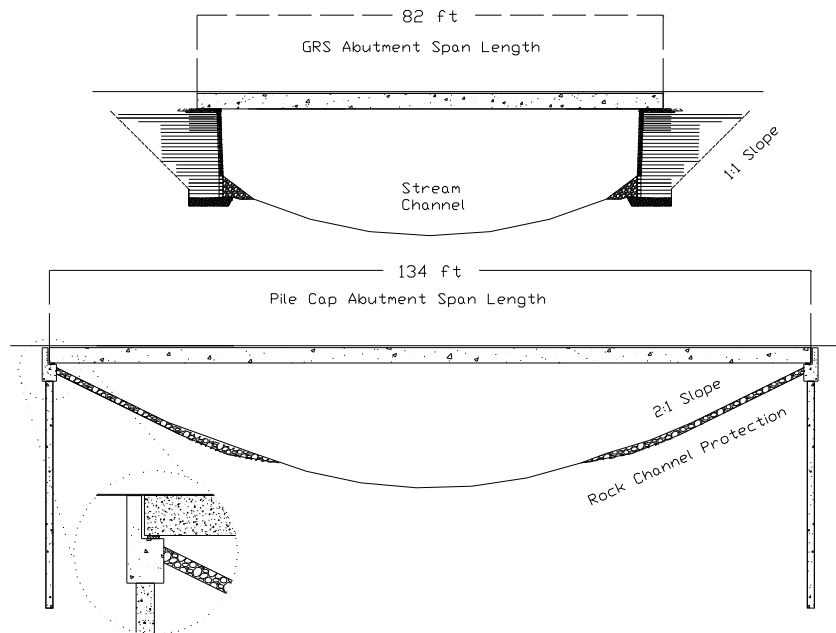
Illustration of Bridge Span Length for GRS and Pile Cap Abutments
